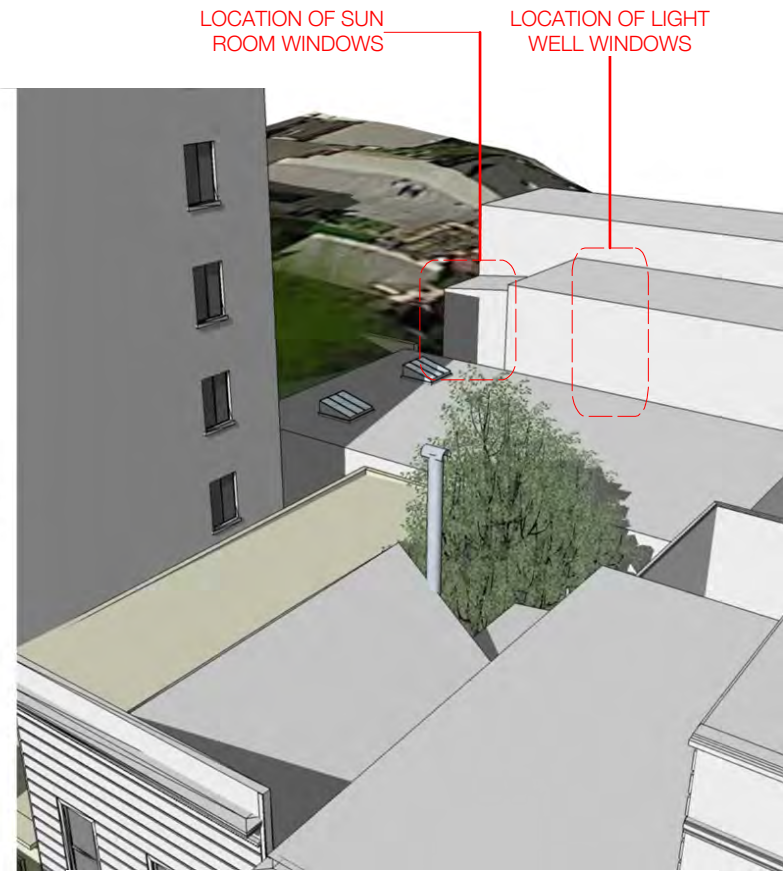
EXISTING SHADOWS - SEPT 1ST, 3:30PM
